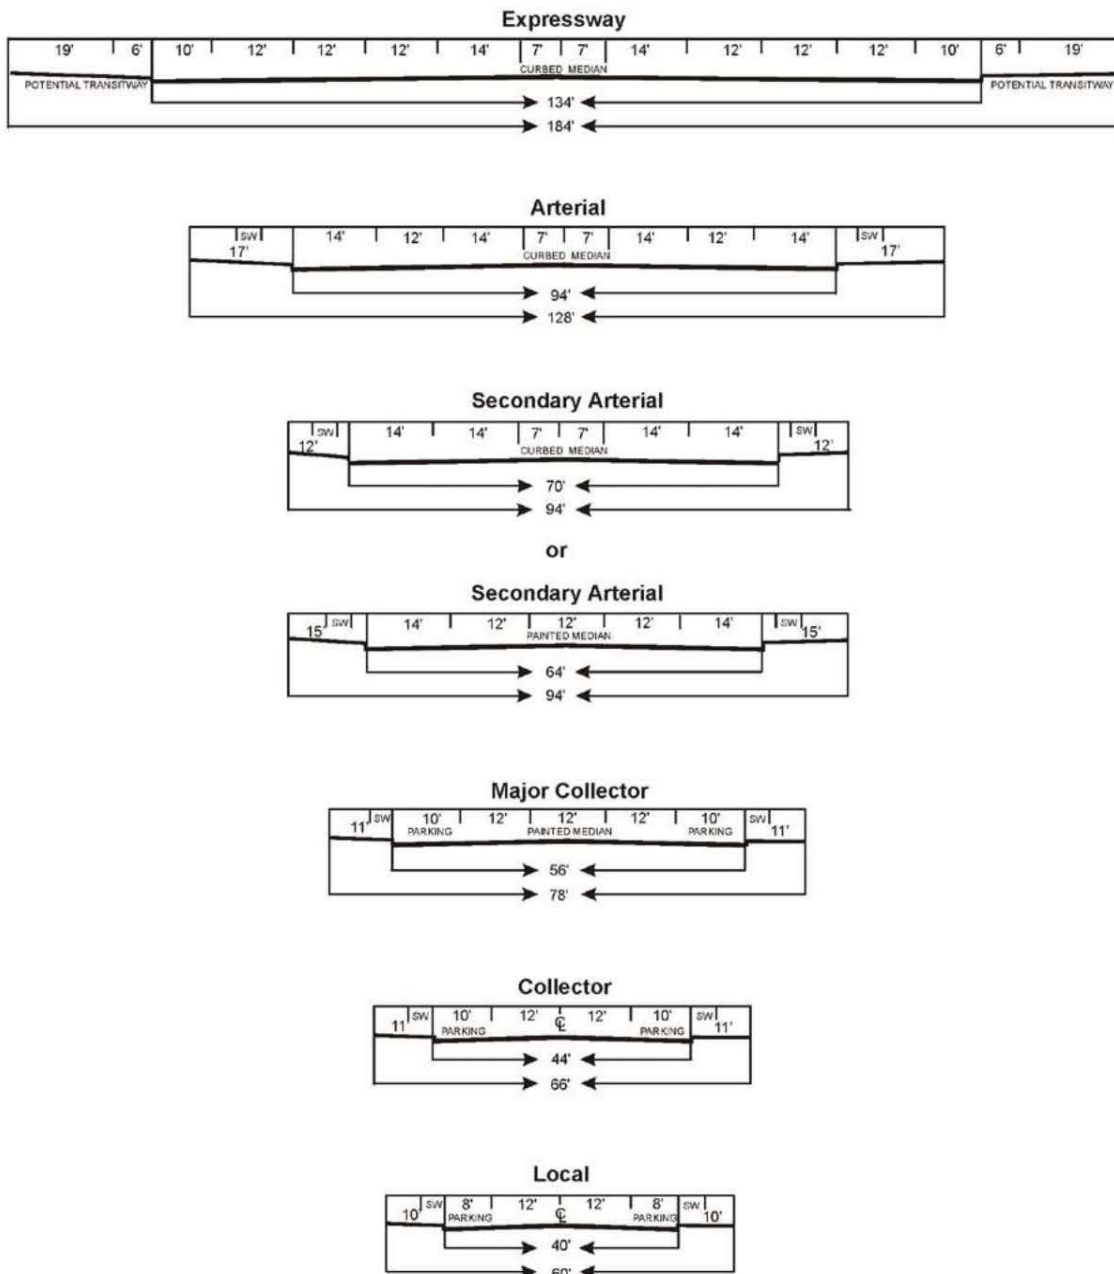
CITY OF PERRIS GENERAL PLAN ROADWAY CROSS-SECTIONS
